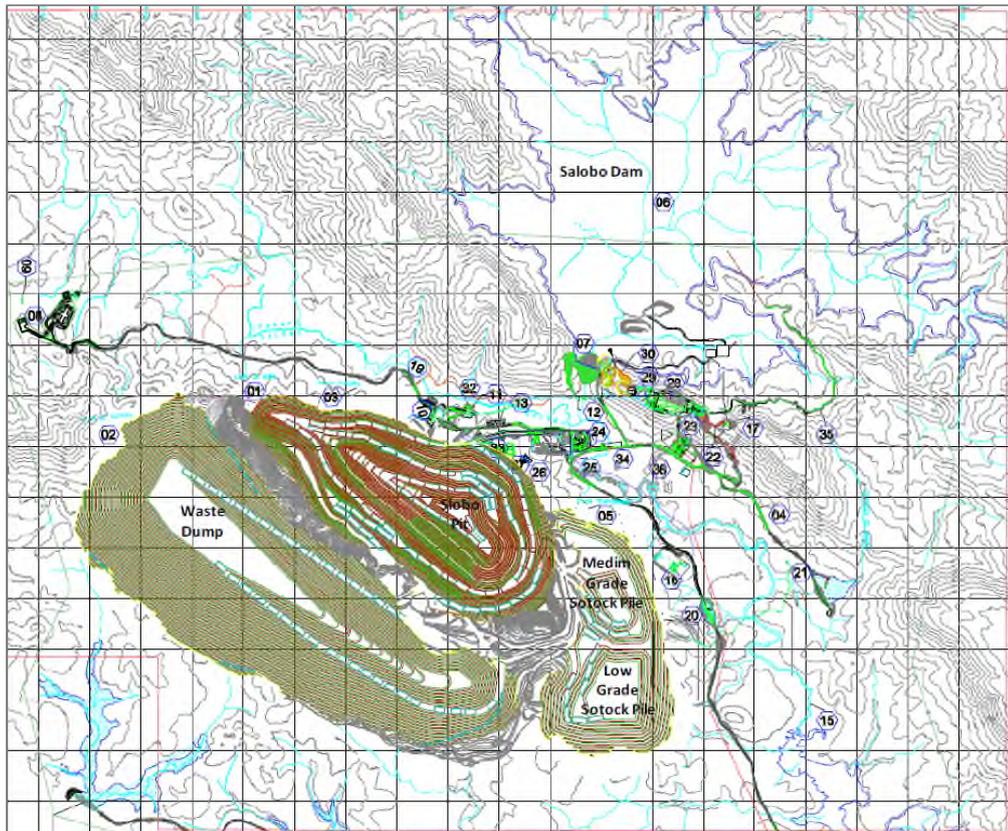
Location Plan, Waste Rock Storage Facility and Low-Grade Stockpiles
